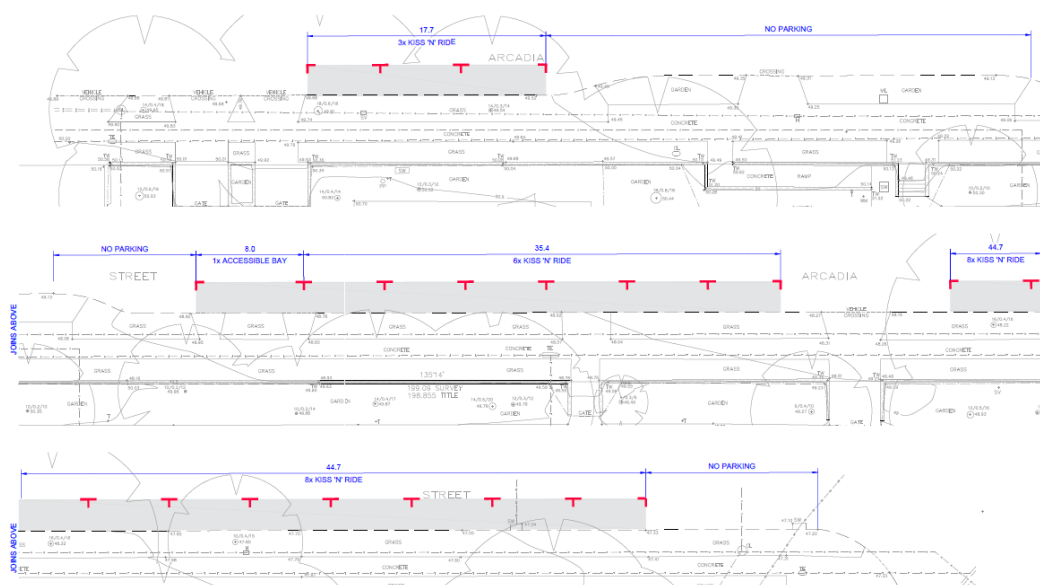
Extract of Kerbside Parking Allocation Plan for Arcadia Street (Prepared by TTM)
